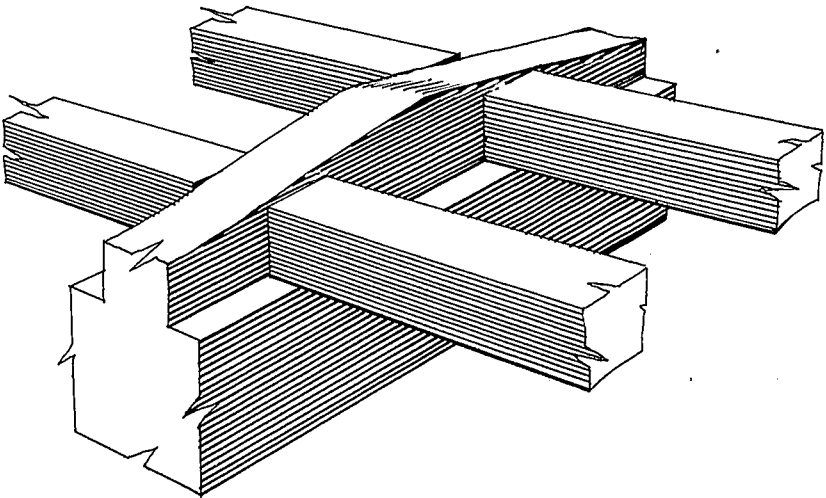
(b). Tie-beams at Centre, showing Camber rebated to straight Line on each Edge.
